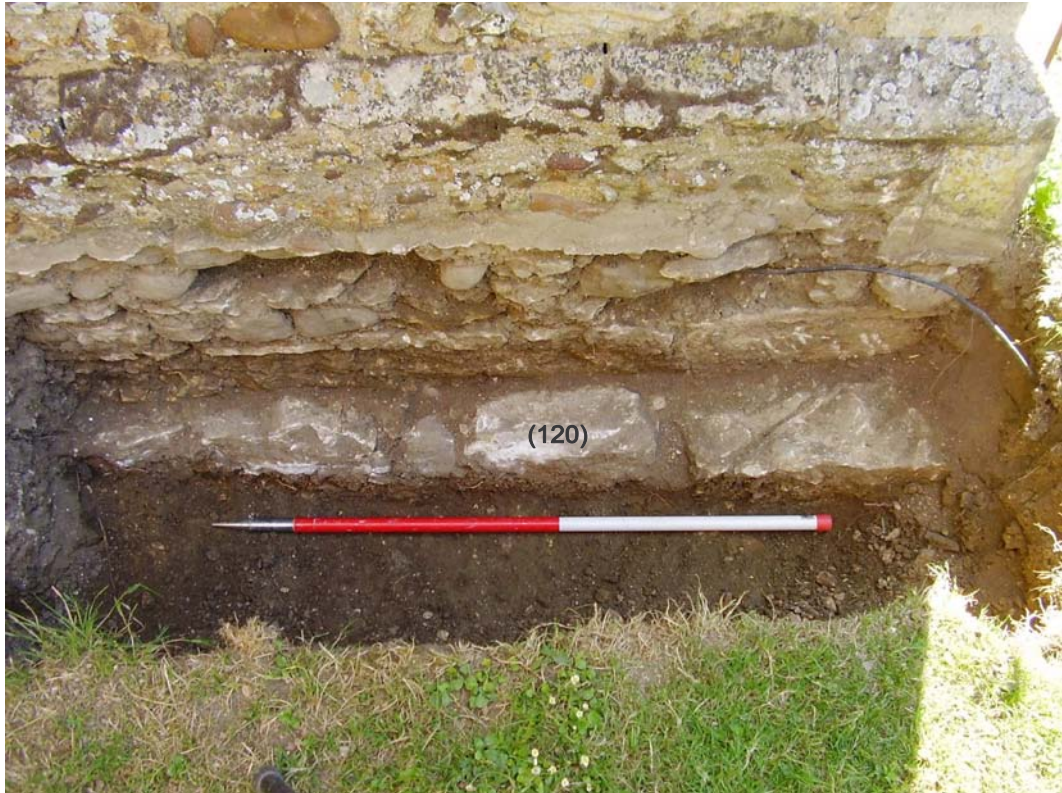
Foundation plinth (120) beneath west wall of south porch Scale 1m
